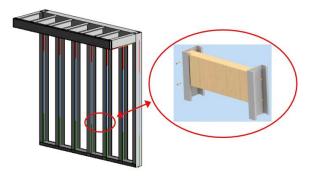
Work settings for Task 2: metal stud walls and block installation.
